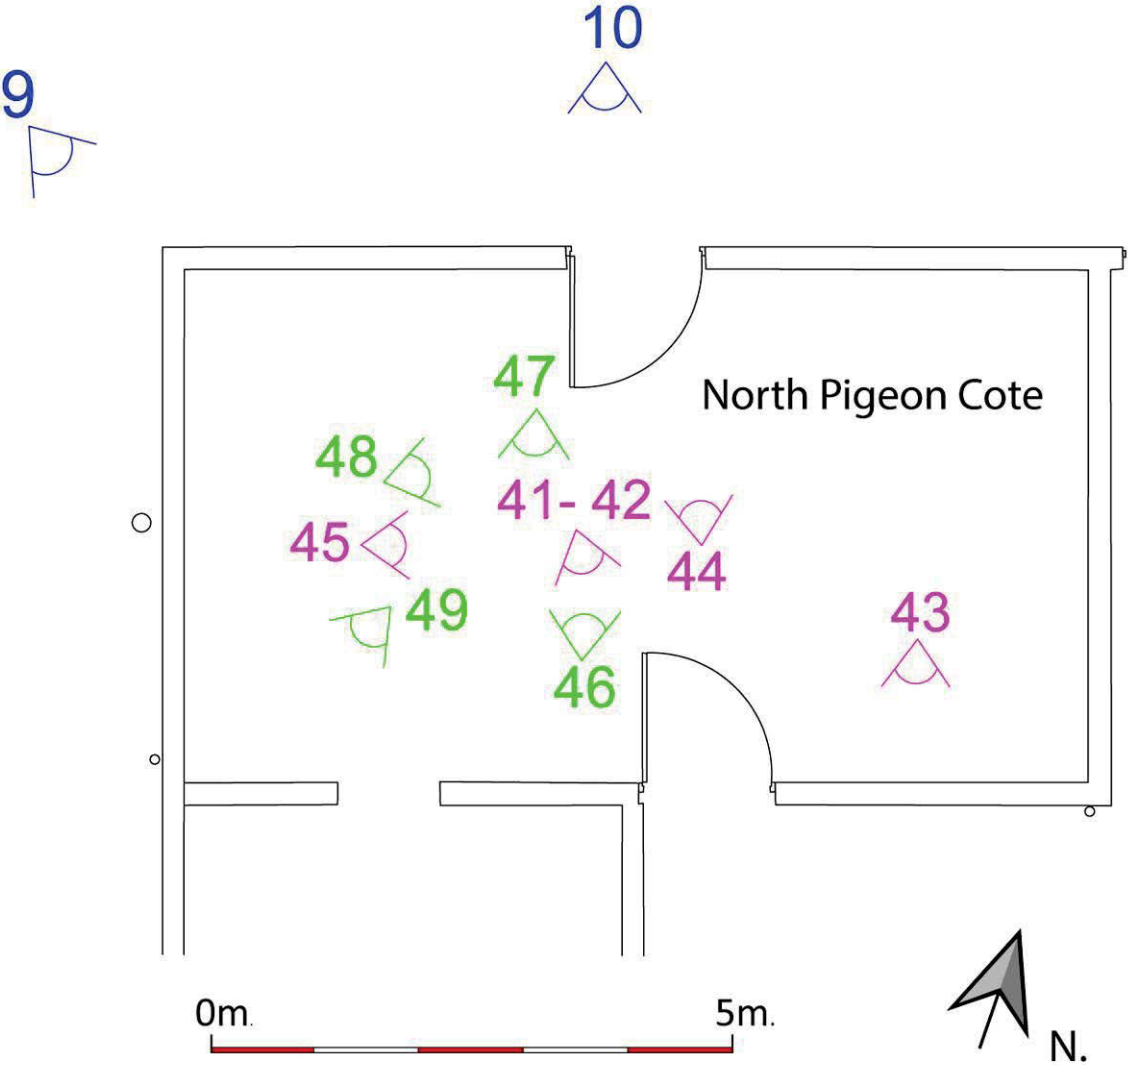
Plan showing the direction of the photographs taken for the North Pigeon Cote
